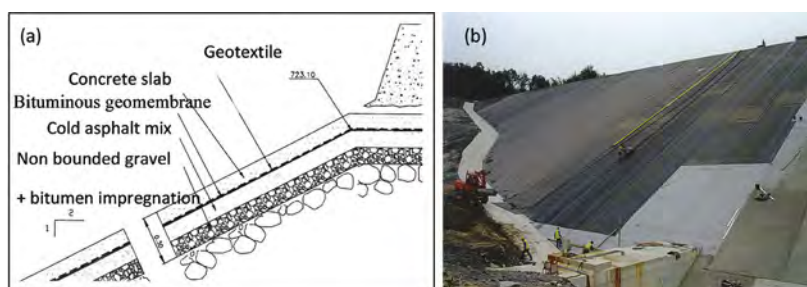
La Galaube dam in France: (a) typical cross section at the top (after Gautier, 2003); (b) placing of geotextile protection layer (in grey) over the bituminous geomembrane layer (in black).
